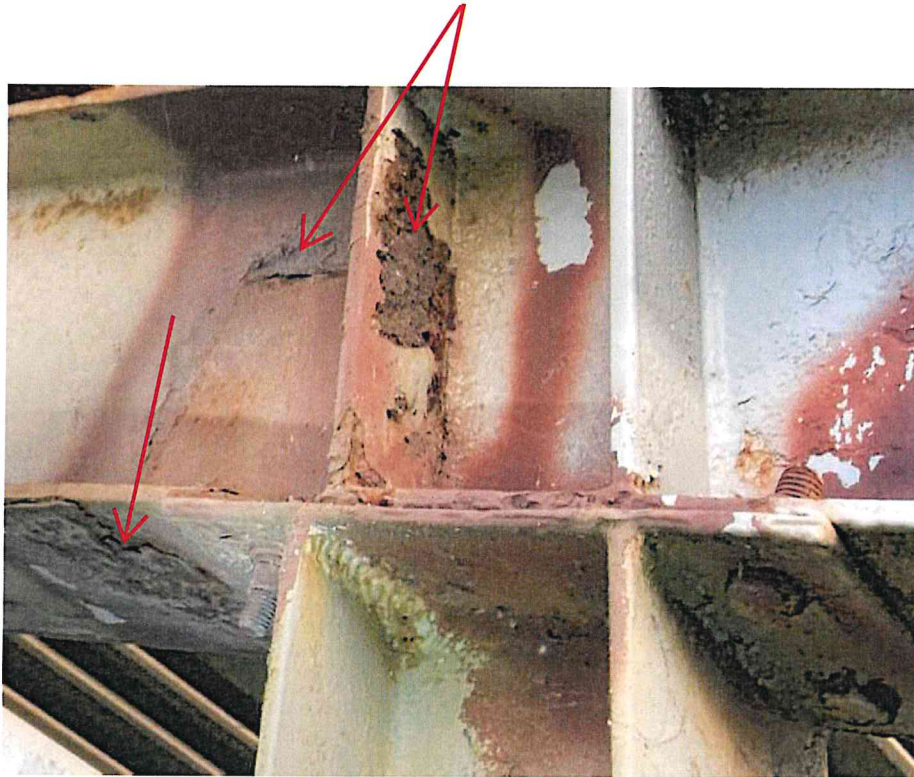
Photo showing severe corrosion at beam web & flange near column cap plate (indicated by red arrows) and stiffener plates
